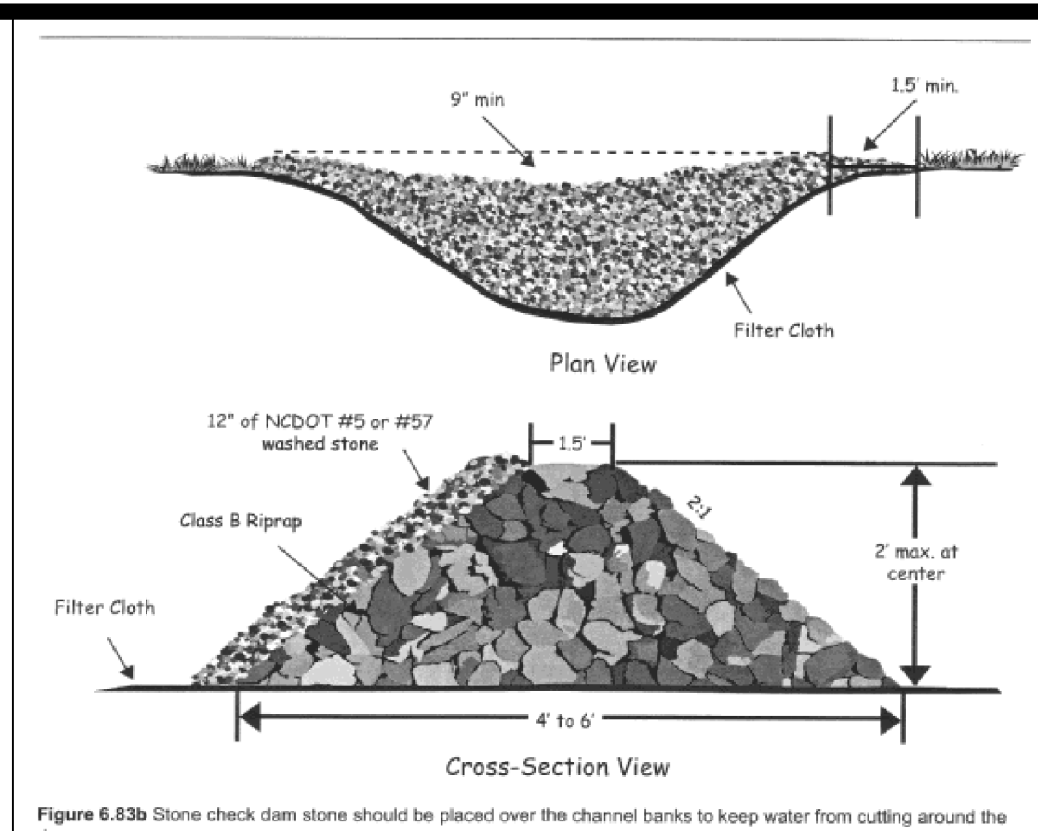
Stone check dam stone should be placed over the channel banks to keep water from cutting around the dam.
